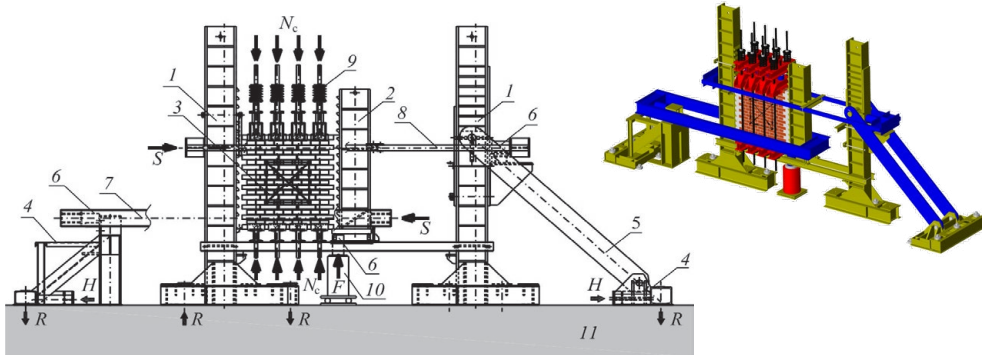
Test stand: 1 – external column, 2 – internal column, 3 – masonry specimen, 4 – resisting member, 5 – tension member, 6 – load cell, 7 – lower tie, 8 – upper tie, 9 – members inducing compressive stresses, 10 – hydraulic jack, 11 – laboratory floor. *Source:* own study
